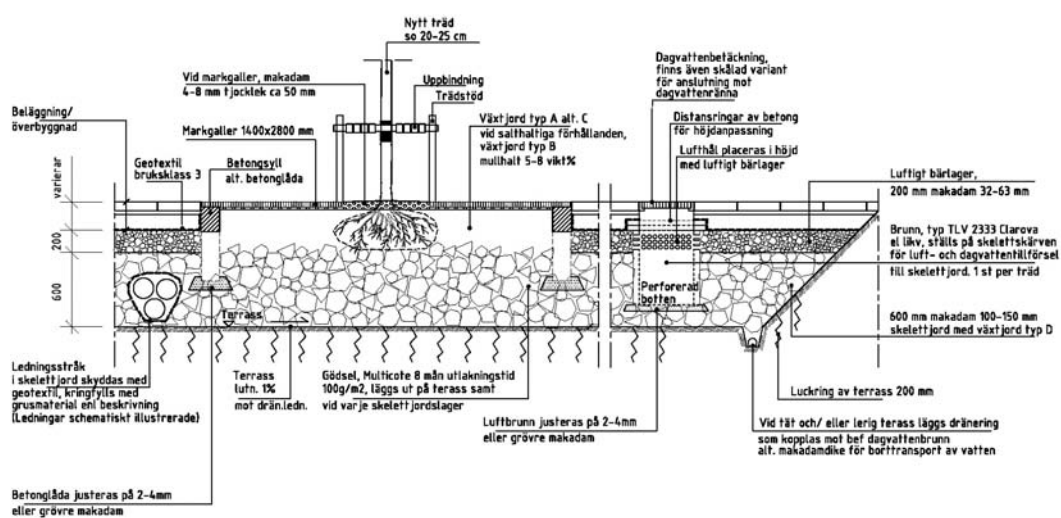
Figure is a cross section of planting beds planned in city of Stockholm. (Planting beds in city of Stockholm 2009).
